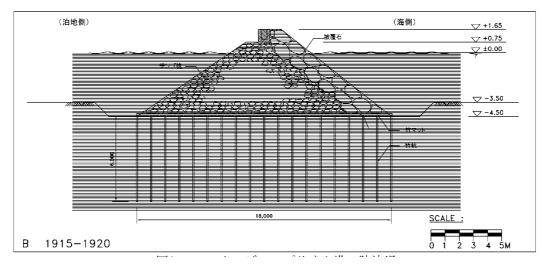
C-3 Typical Section of Existing Breakwater of Tanjung Priok Port
